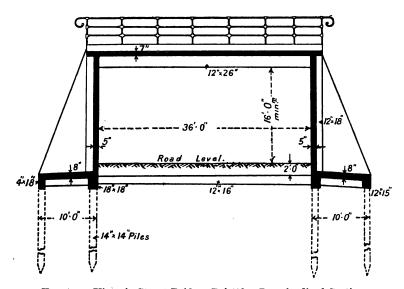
Victoria Street Bridge, Bristol. Longitudinal Section.
